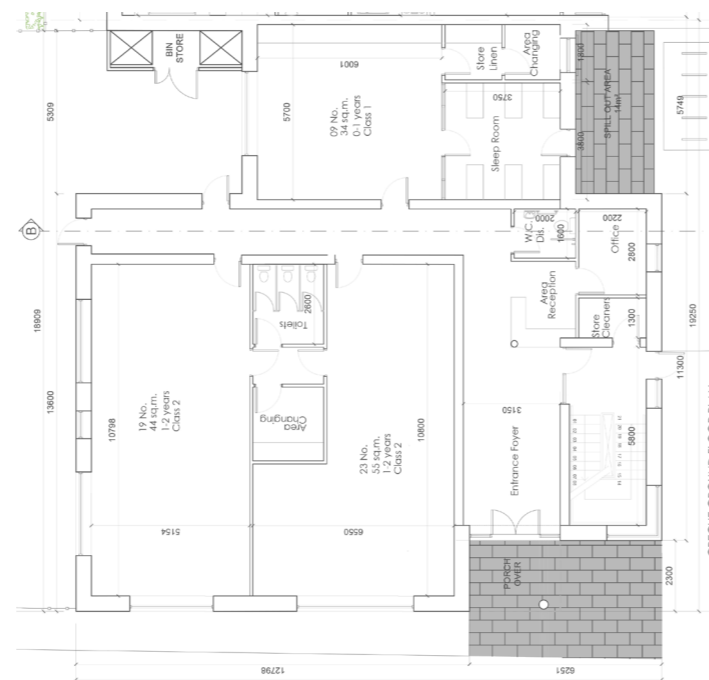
Ground floor of crèche proposed. Source: MCORM, 2022.
